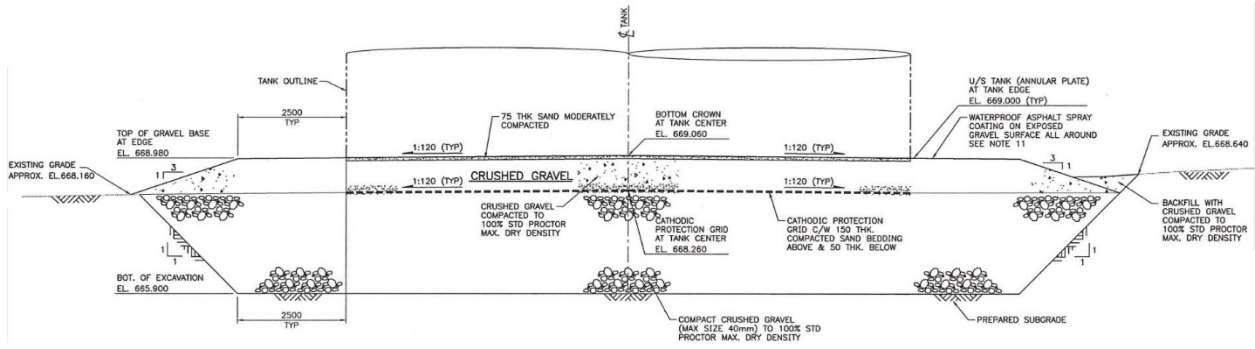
Firewater Tank Gravel Pad Foundation Design.
